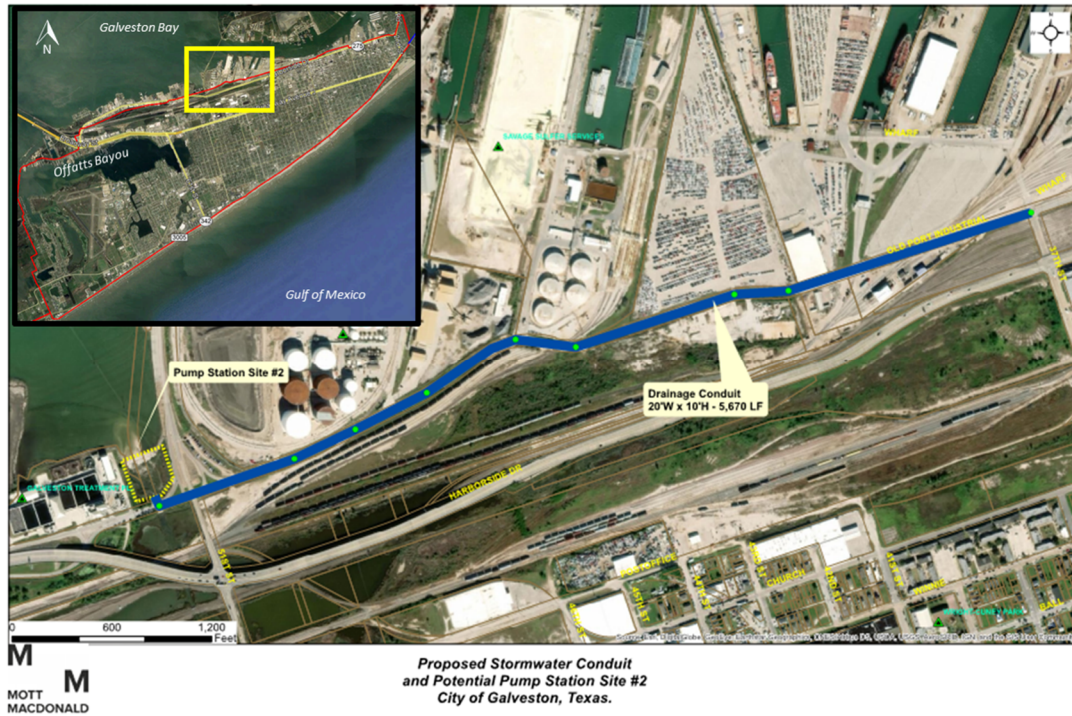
Original proposed stormwater conduit into Pump Site 2.
